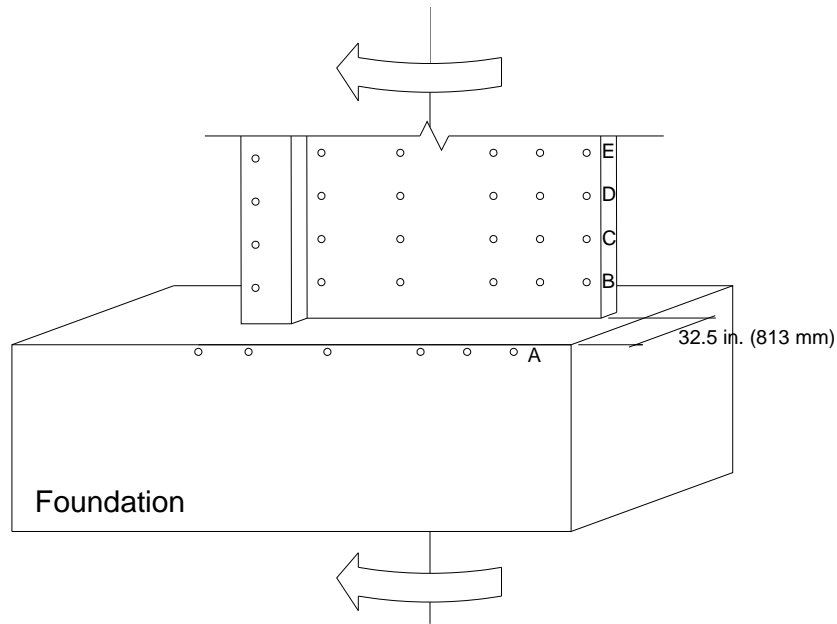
The twist of individual walls about a vertical axis caused markers in row A (on the foundation) to move laterally relative to the markers in rows B through E (on the wall) due to their proximity to the stationary cameras
